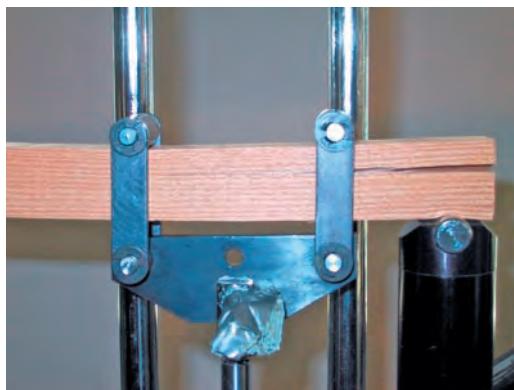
Longitudinal shear failure in timber beam.
